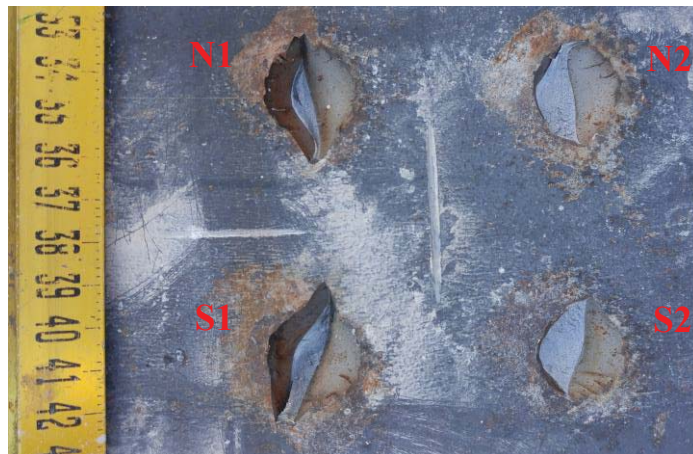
Fatigue cracking into the top flange of Specimen P140.
